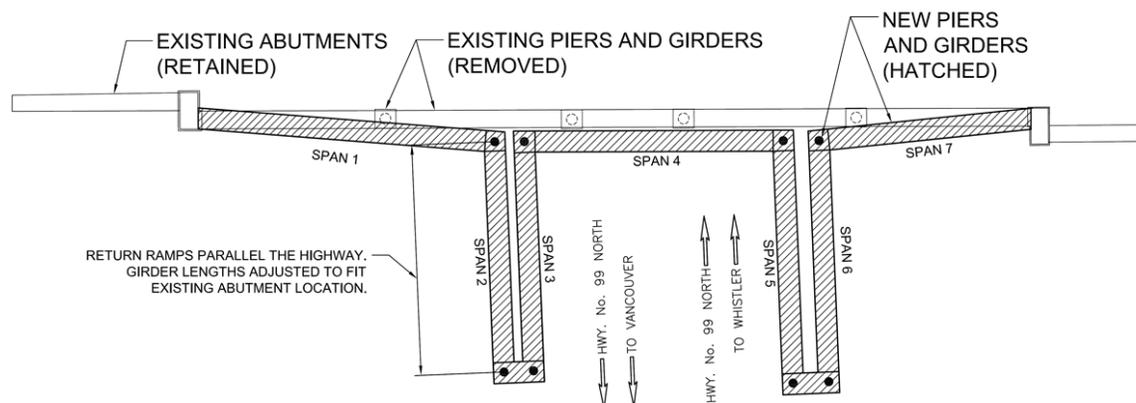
Garibaldi Pedestrian Overpass - Bridge Layout
